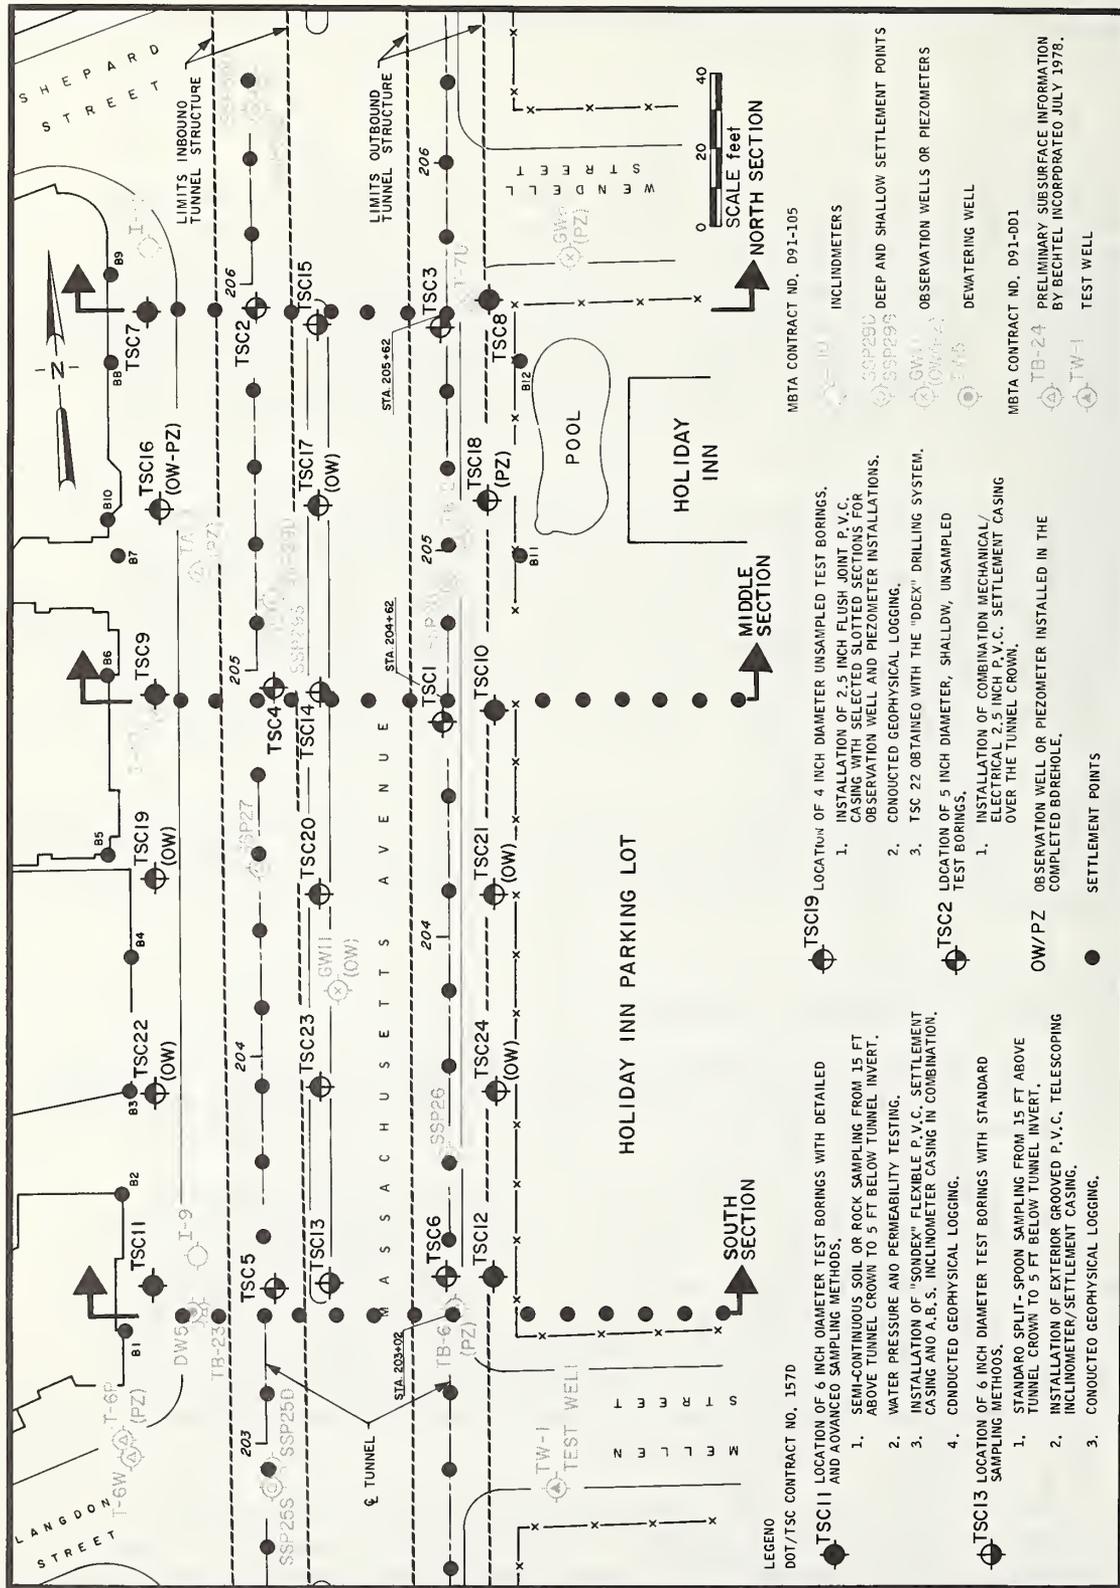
INSTRUMENTATION LOCATION PLAN, TEST SECTION, CAMBRIDGE, MASSACHUSETTS
